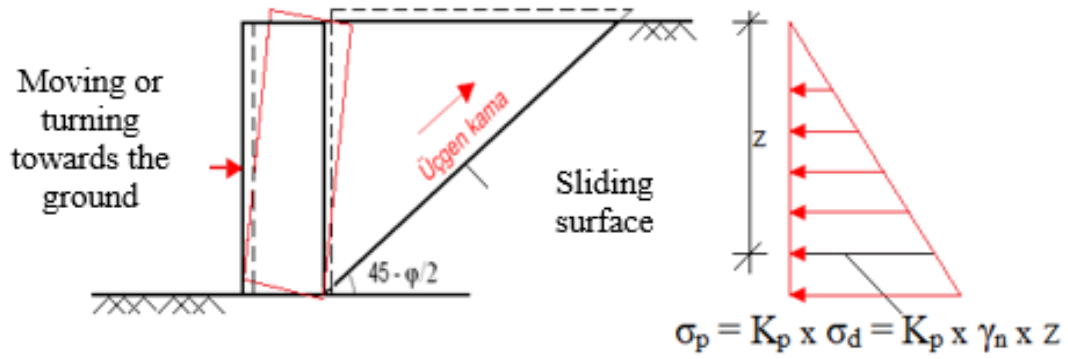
Passive condition behind a retaining wall in cohesionless soil.
